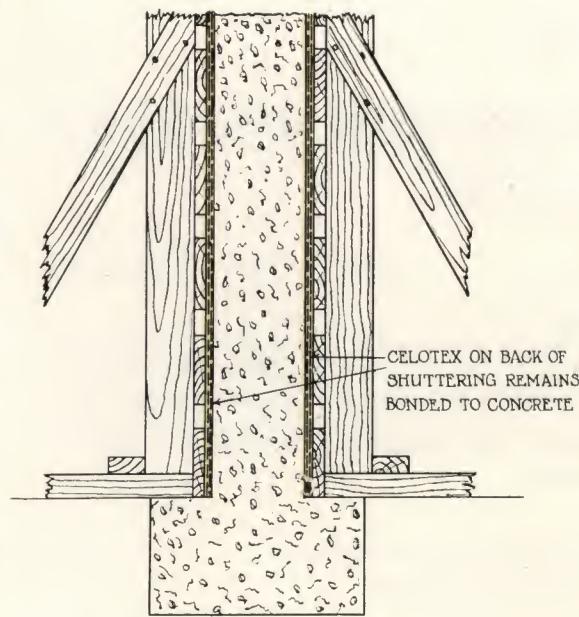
CELOTEX FOR FACING VERTICAL CONCRETE WALL SHUTTERING
